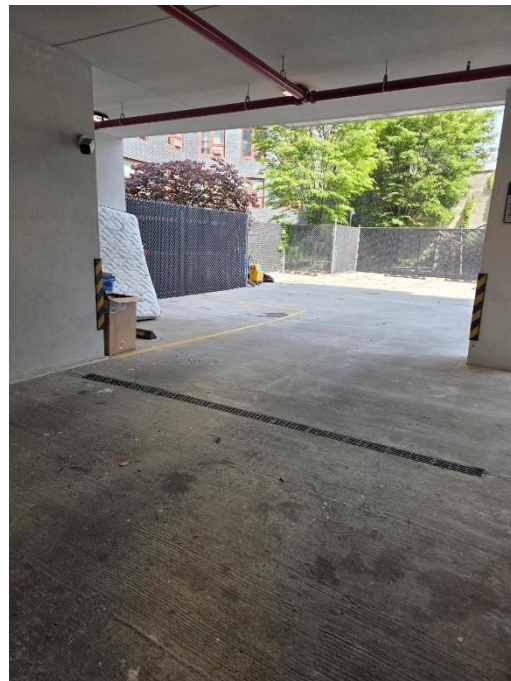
Garage area facing rear yard and parking area, followed by fencing, facing northwest
